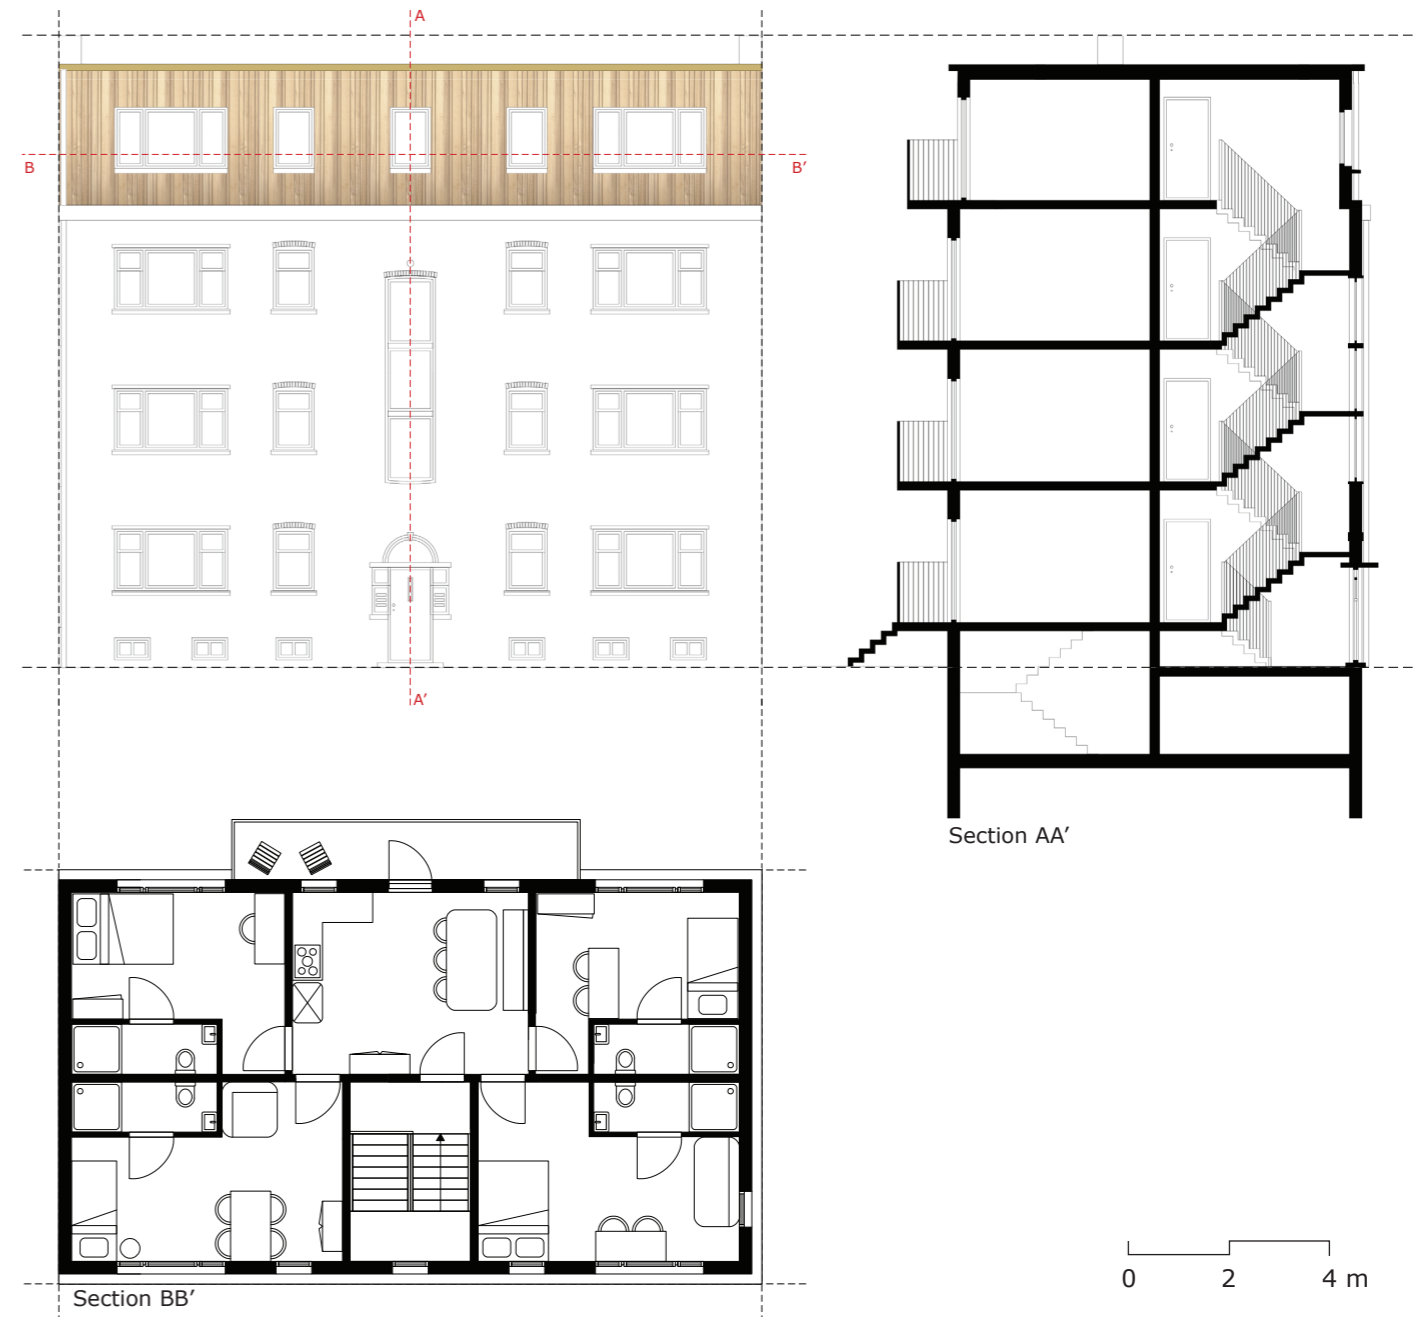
Elevation and cross-sections of the apartment buildings with an additional stories.
